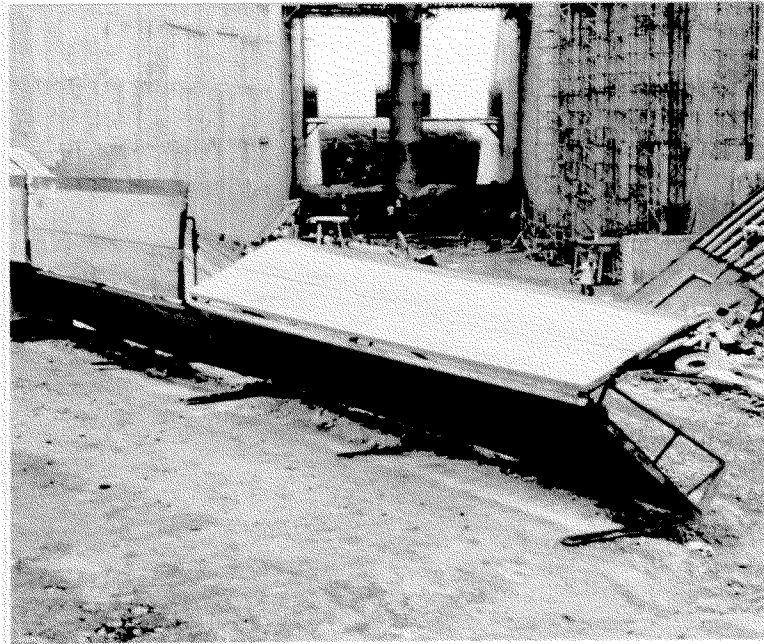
Shuttering for the construction of the geotextile reinforced embankment fill.
